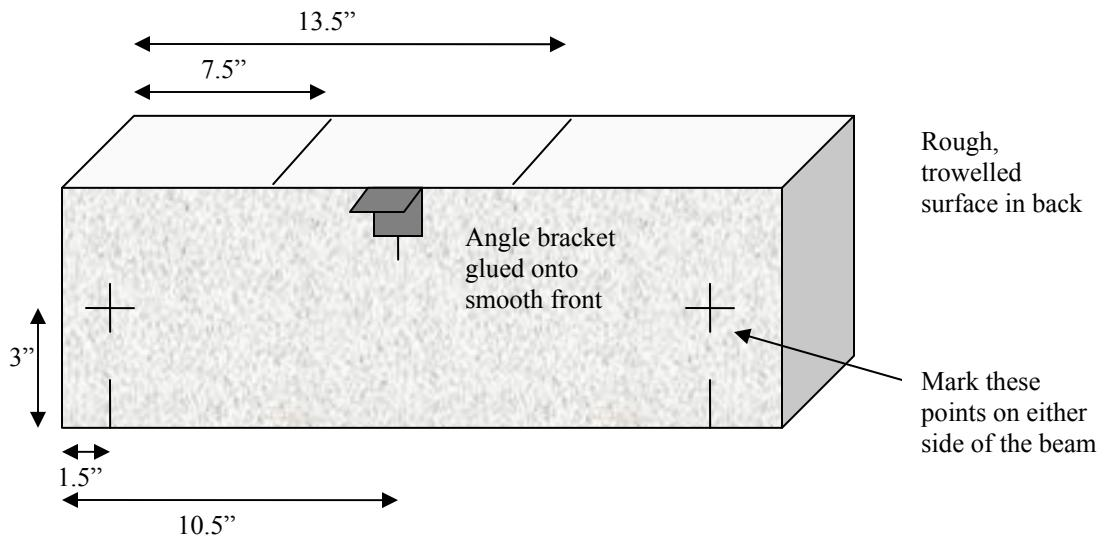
Suggested marking locations with dimensions in inches (1 inch = 25.4 mm).
